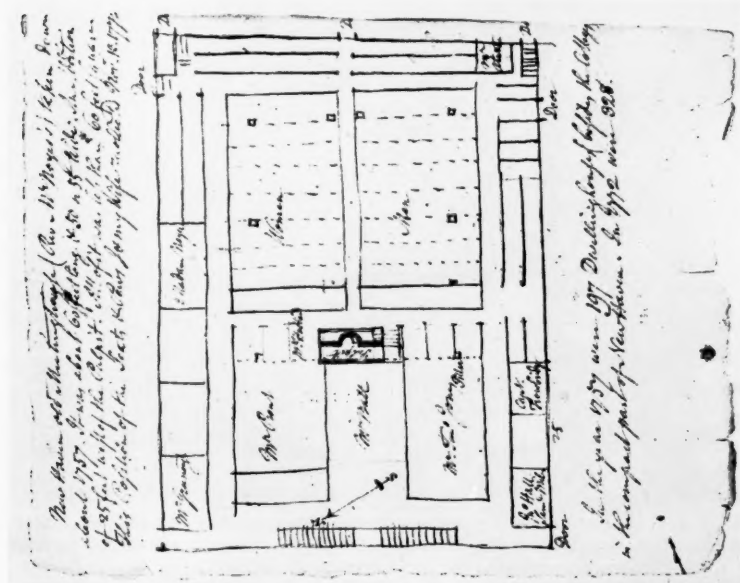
Plan of 1670 New Haven meetinghouse drawn by Ezra Stiles as it was in 1757.
